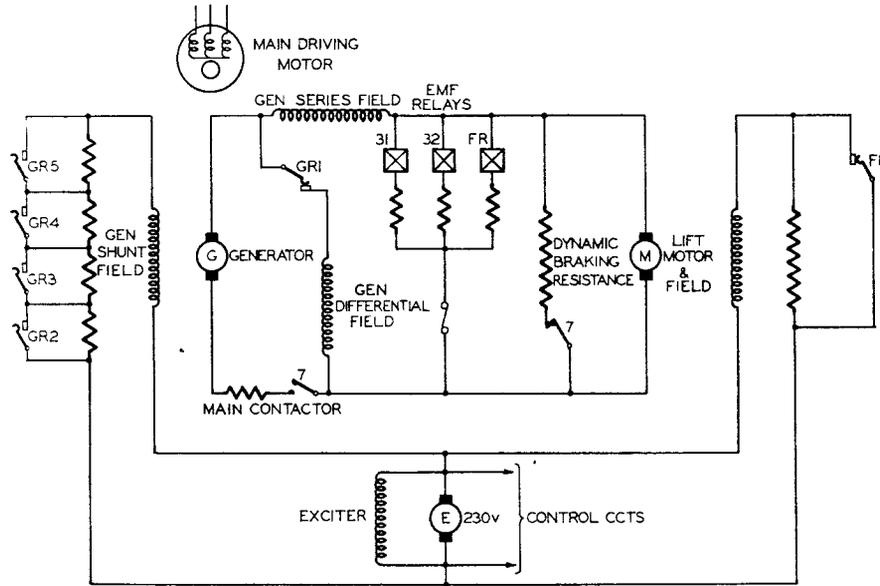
MOTOR, GENERATOR AND E.M.F. RELAY CIRCUITS
